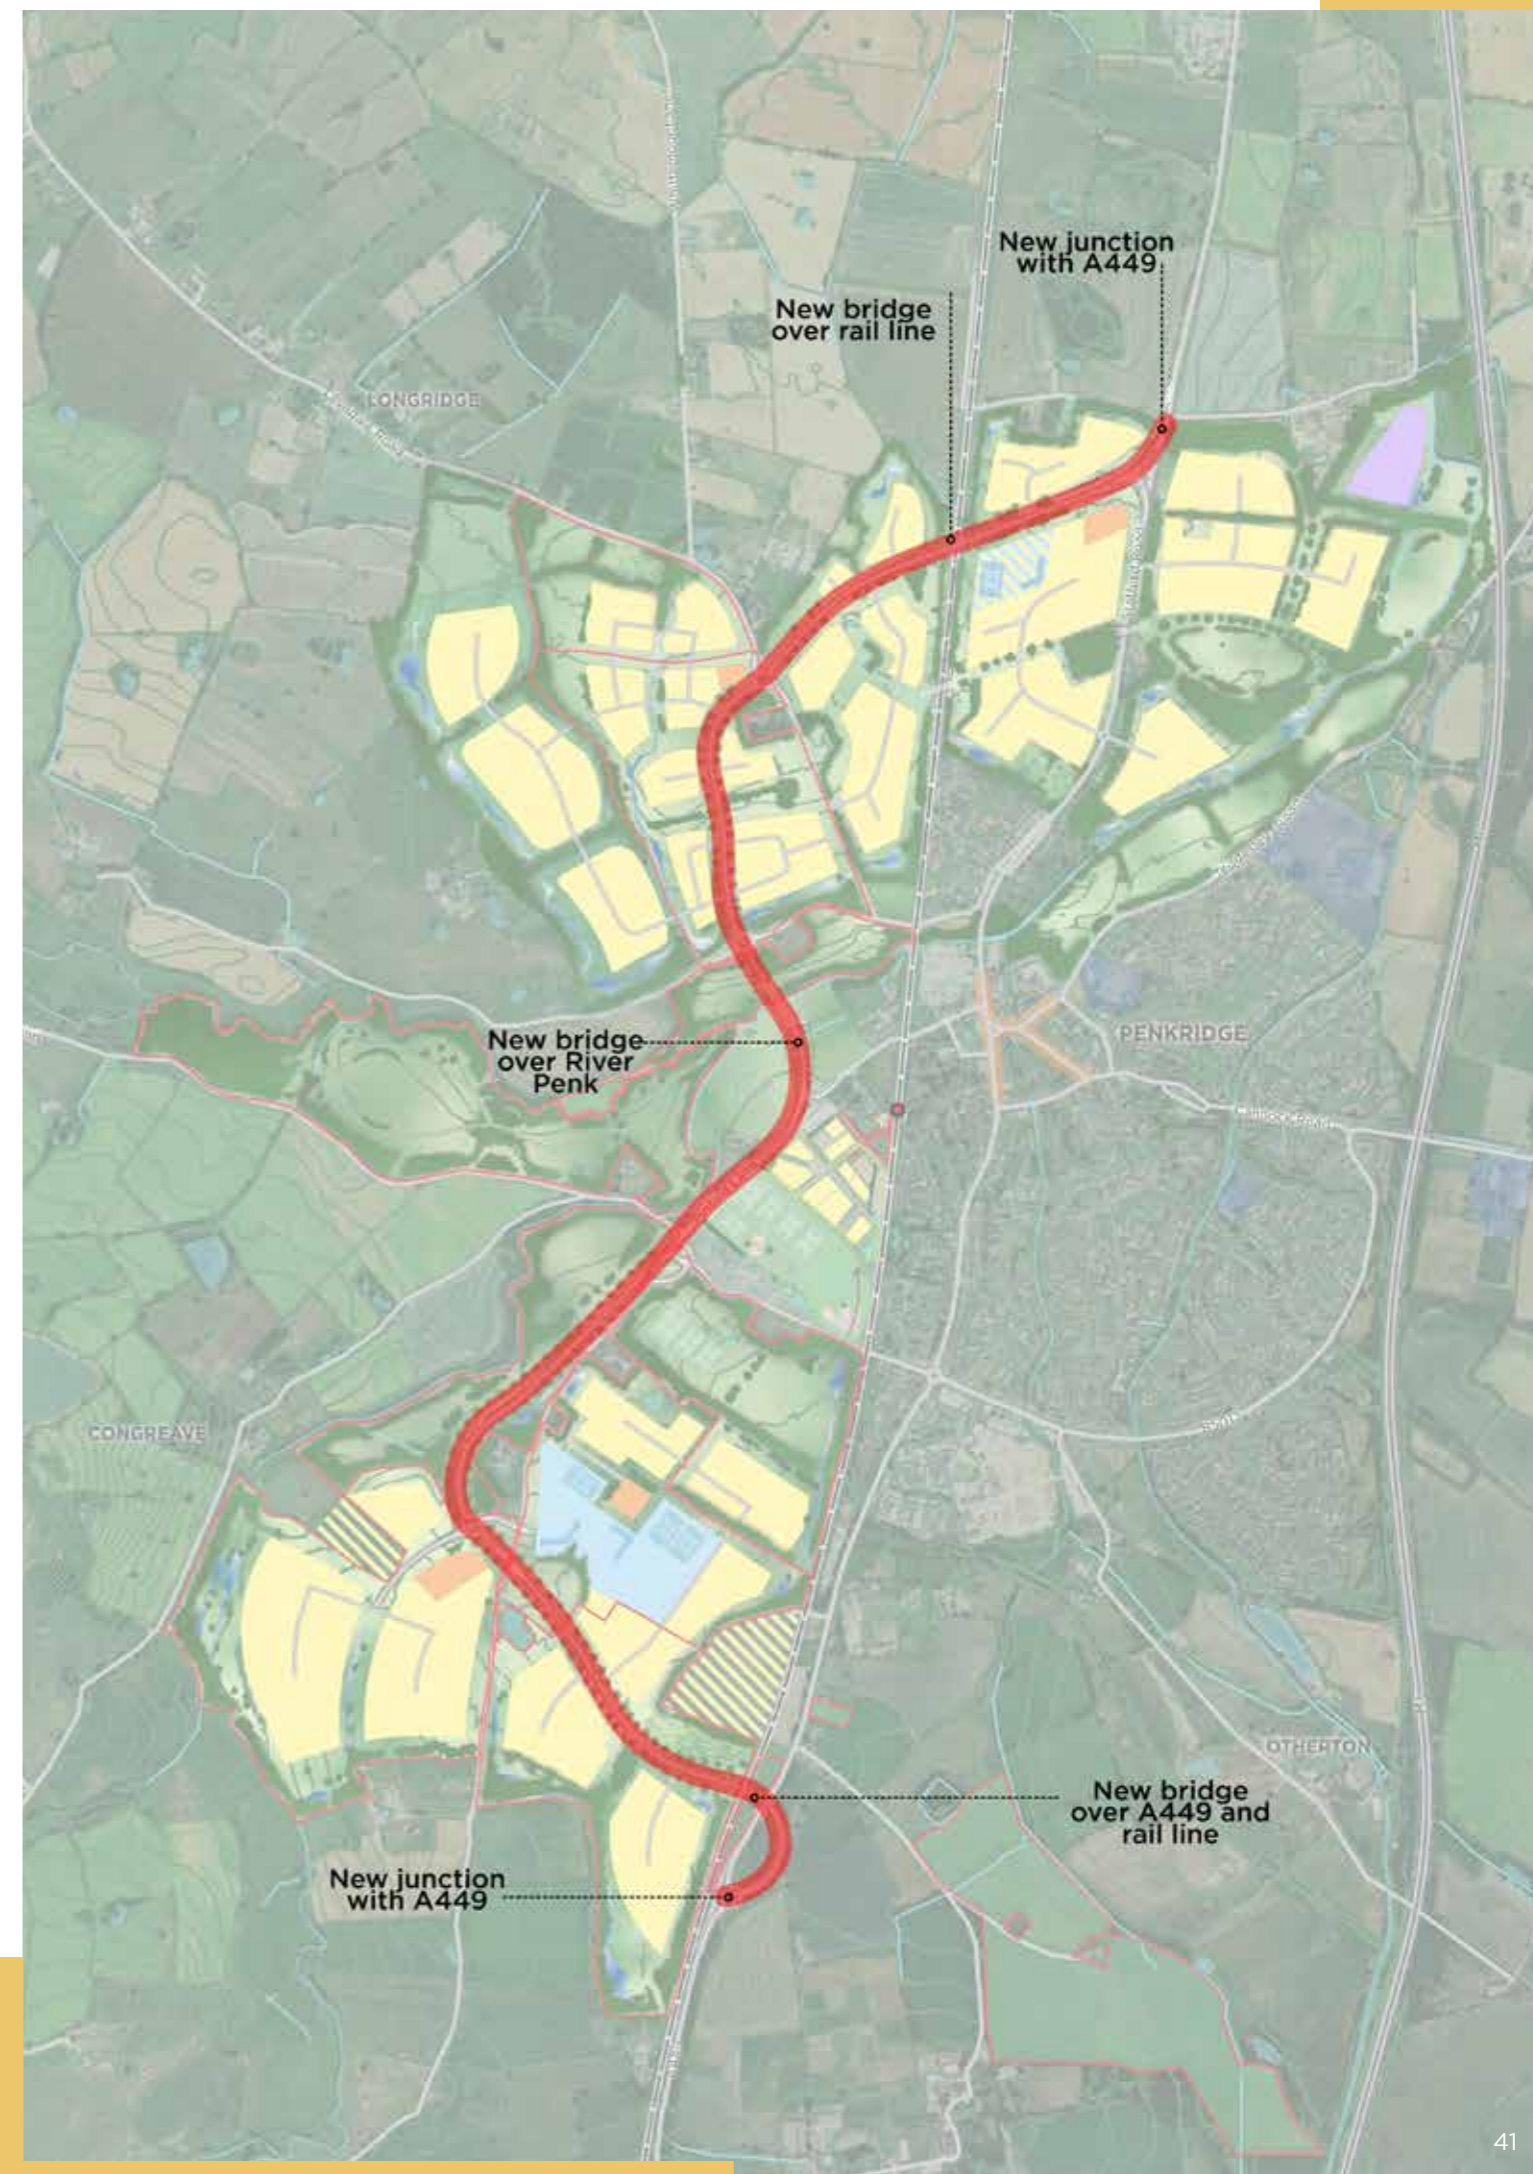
ROUTE OF PROPOSED SPINE ROAD
